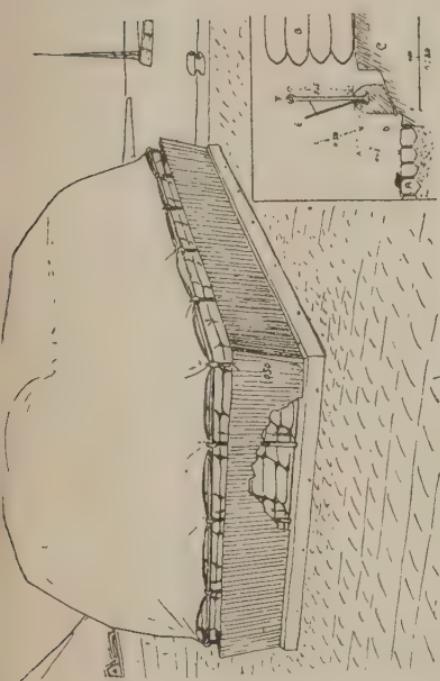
Stacked on solid platform of cement raised 60 or 80 cm. above ground on strong masonry piles. Galvanized iron sheeting, inclined outwards at an angle of 55° from the horizontal, is placed round the platform to form a 1.5-m. high wall 55 cm. high. The sheeting is attached to metal tubing. The sheeting is placed round the platform as in fig. 62.
